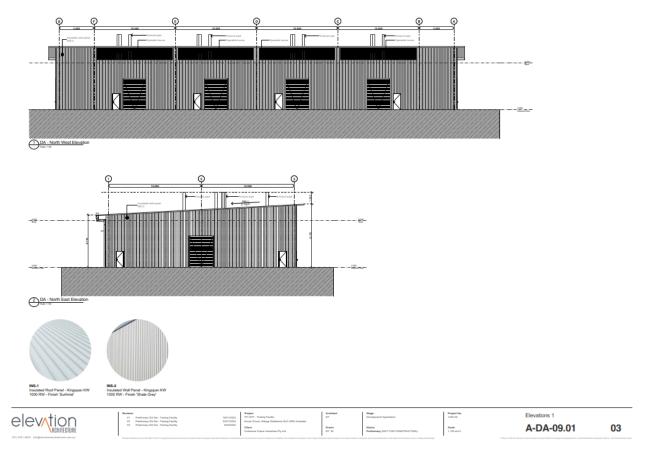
Building Elevations 1 (Source: With Architecture Studio)
